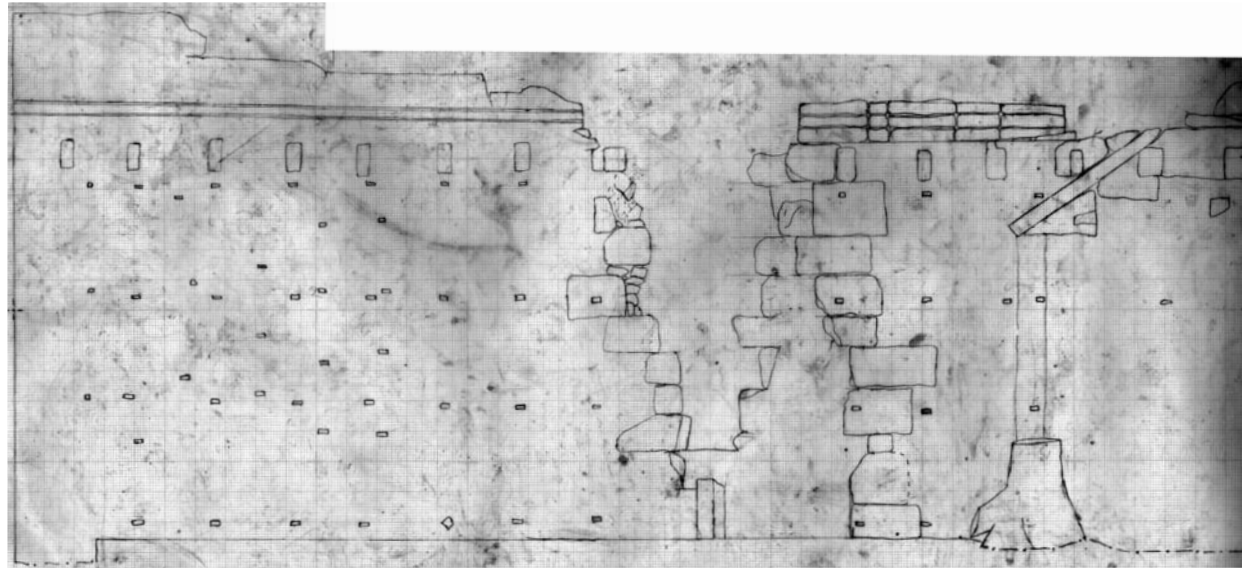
S facing internal elevation of Eastern Chamber - Drawing No.005
